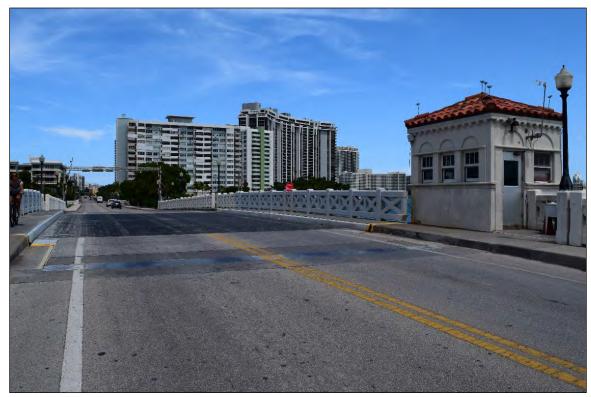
Existing Concrete Decking, Sidewalks, and Railings within the Archaeological APE at Venetian Causeway Bridge 10 (8DA14382), Facing East
